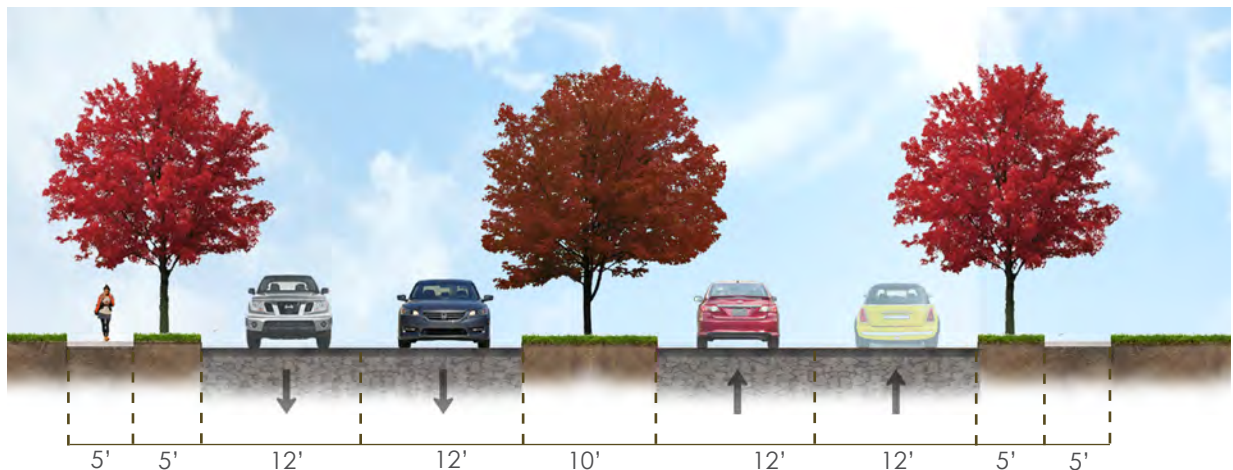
This street section illustrates how four lanes with a center median configuration could be implemented at key locations along Roberts Avenue where crashes have historically occurred.
